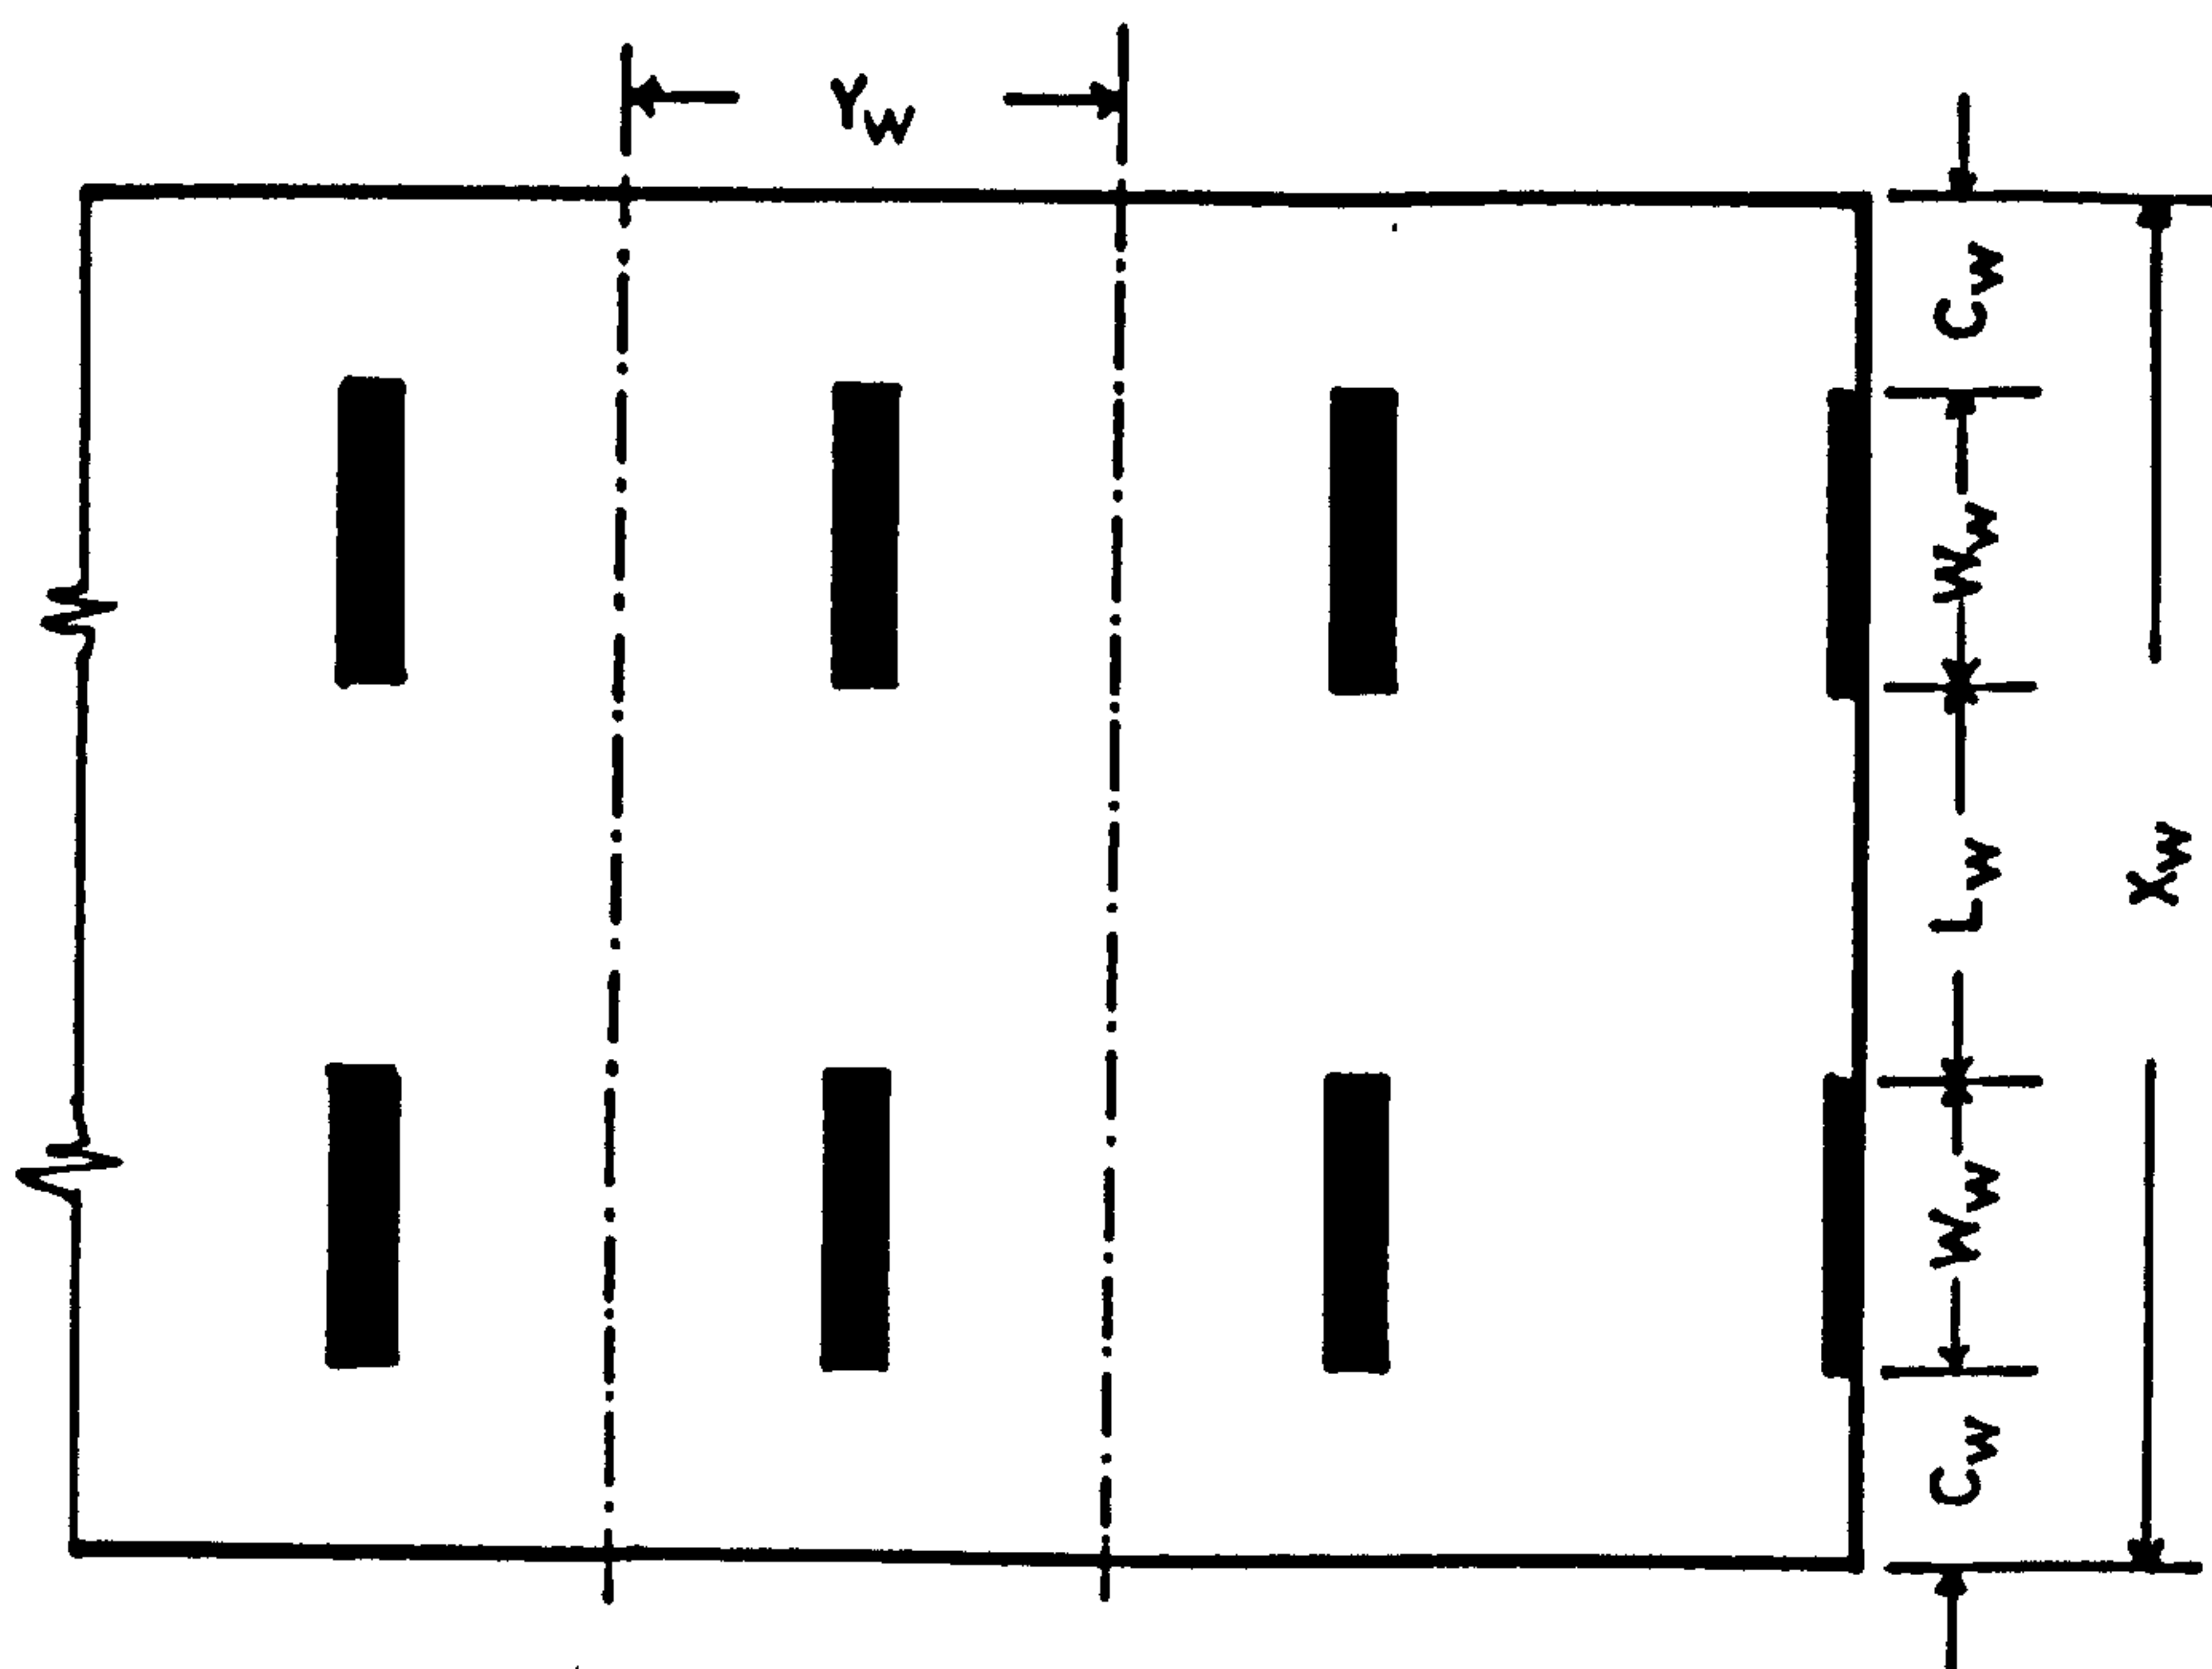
Plan of a typical shear wall structure consisting of planar walls and slabs.
